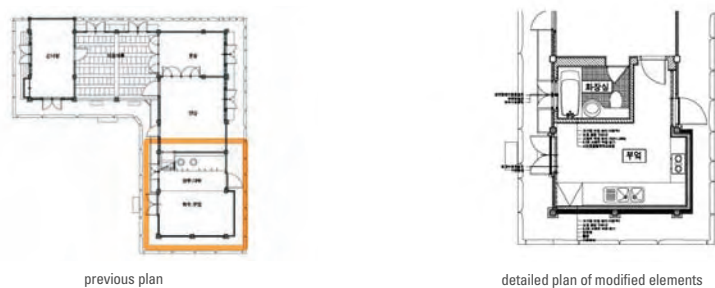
Design Guidelines for Modification of Layout and Structure (installation of bathroom)
